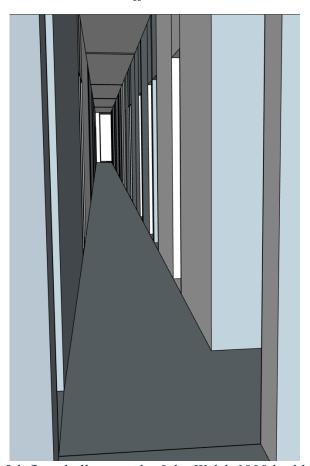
5th floor hallway in the John Walsh 1899 building model.
